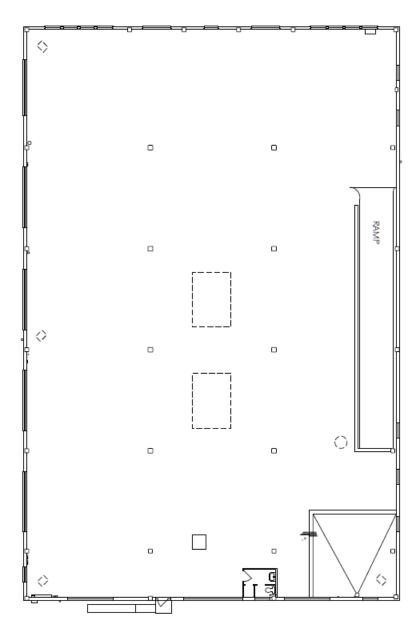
Existing 2nd Floor Plan. Courtesy of Open Studio Architecture. N
